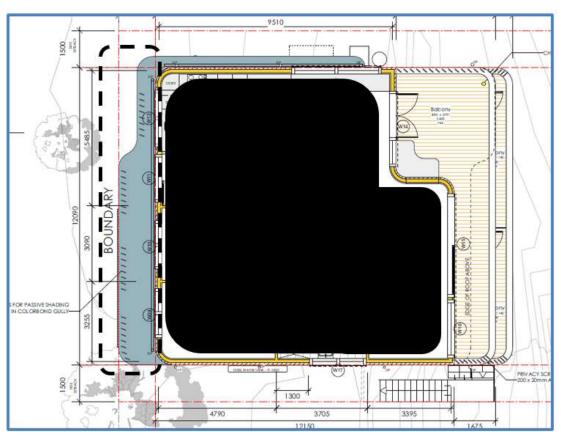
First floor plan showing location of louvres in blue highlight (redacted).
